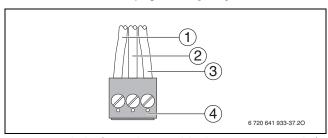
Attach plug (external DHW tank loading pump or 3-way valve)
